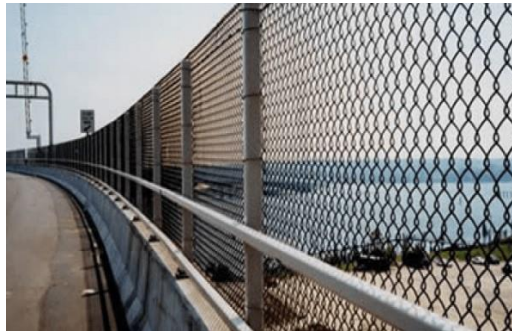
Chain-Link Installed on Top of Concrete Bridge Rail (4).
